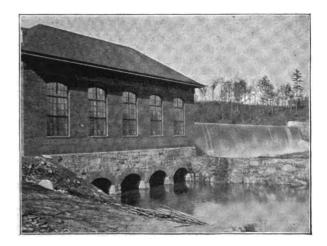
POWER HOUSE AND DAM, PELZER COTTON MILL PLANT.
